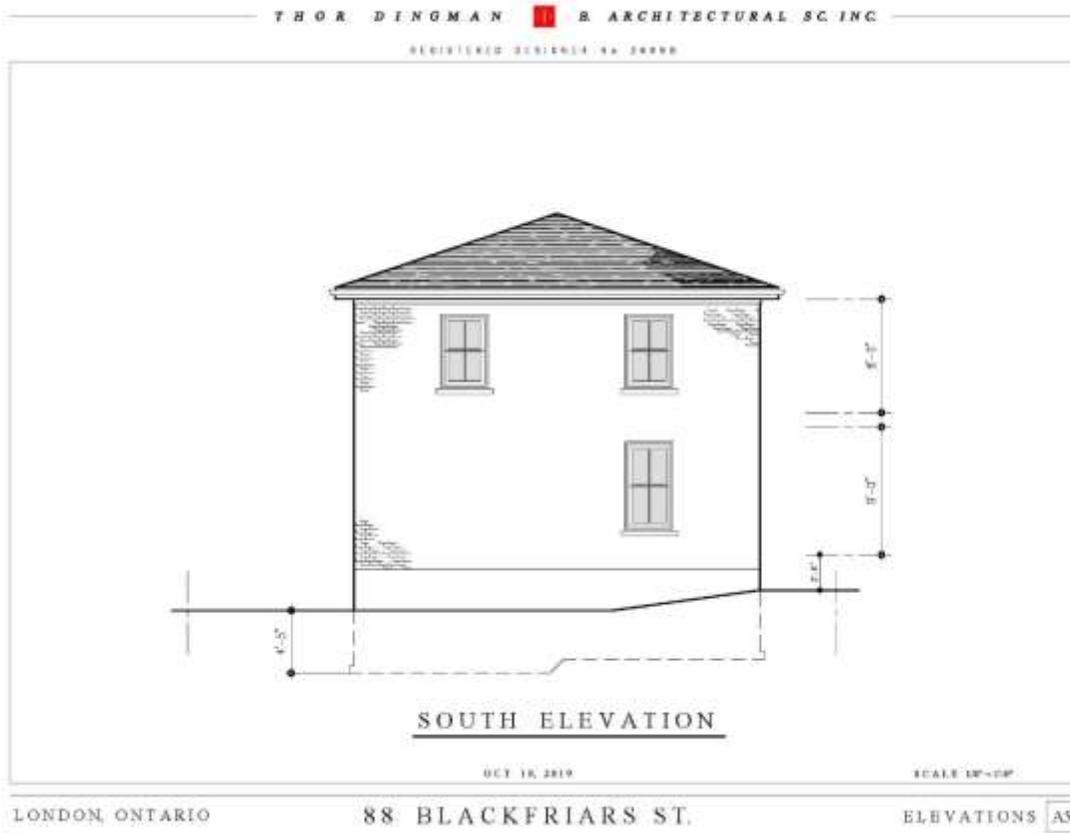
Rear (south) elevation of the proposed building at 88 Blackfriars Street.
